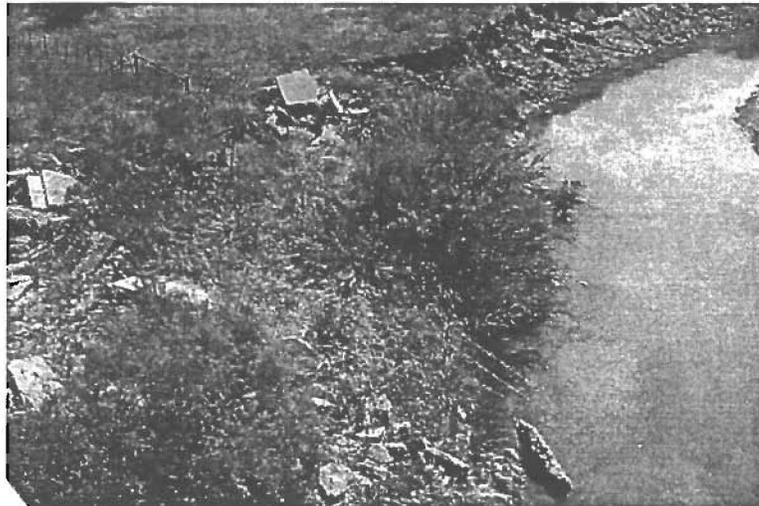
FM 267 bridge crossing the North Wichita River in Childress County showing impingement of margin on south abutment. Southward migration of the erosional cutback on this meander loop is endangering the abutment and approach roadway on the south side of the bridge. Concrete, brick, and asphalt rubble has been dumped on the upstream (west) side of the abutment in an attempt to slow erosional retreat of the bank. This haphazard bank erosion control has fostered illegal dumping and littering in the same area, and resulted in aesthetic and environmental concerns.
